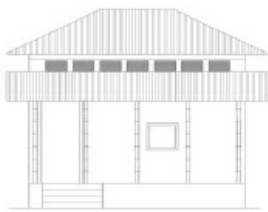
215sq ft house with bamboo and CGI sheet roofing
